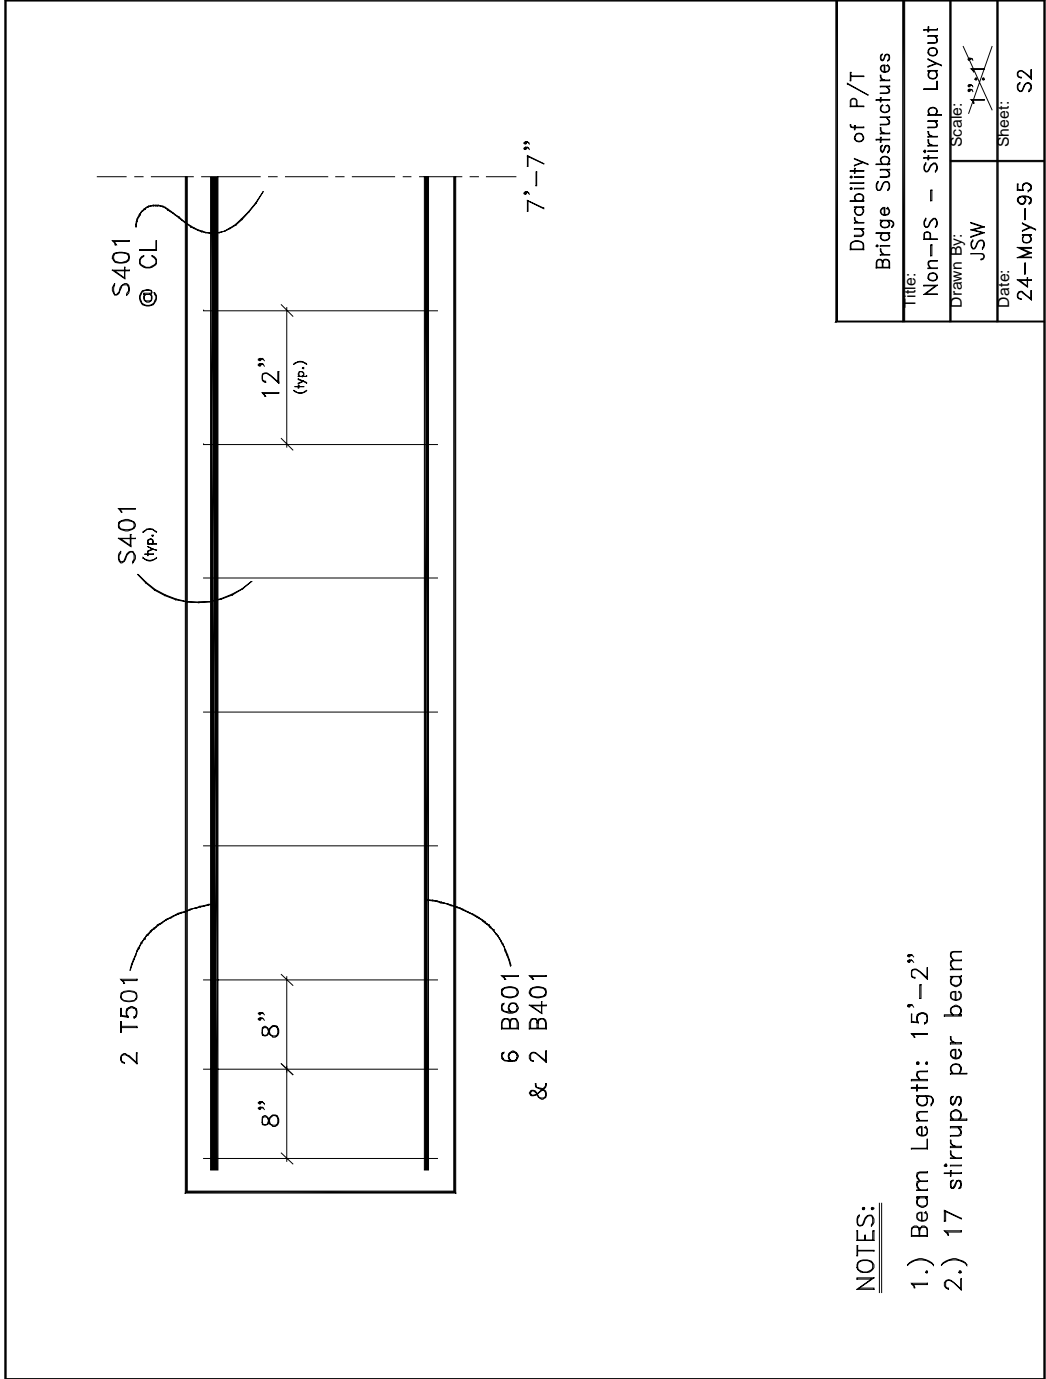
Sheet S2: Non-PS Stirrup Layout
